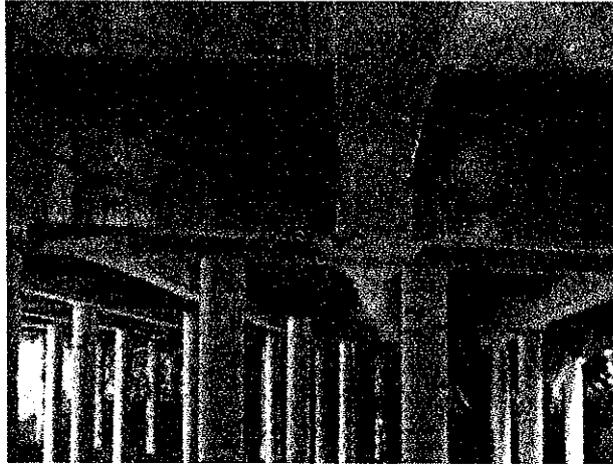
Bridge 29-0173L/R columns and concrete girders (non-suspect)
